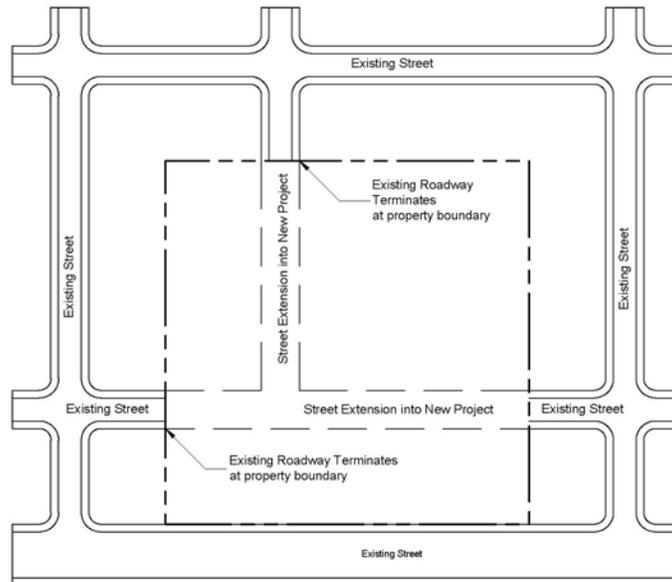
(a).1. – Site Layout – Street Extensions into New Projects/Developments
